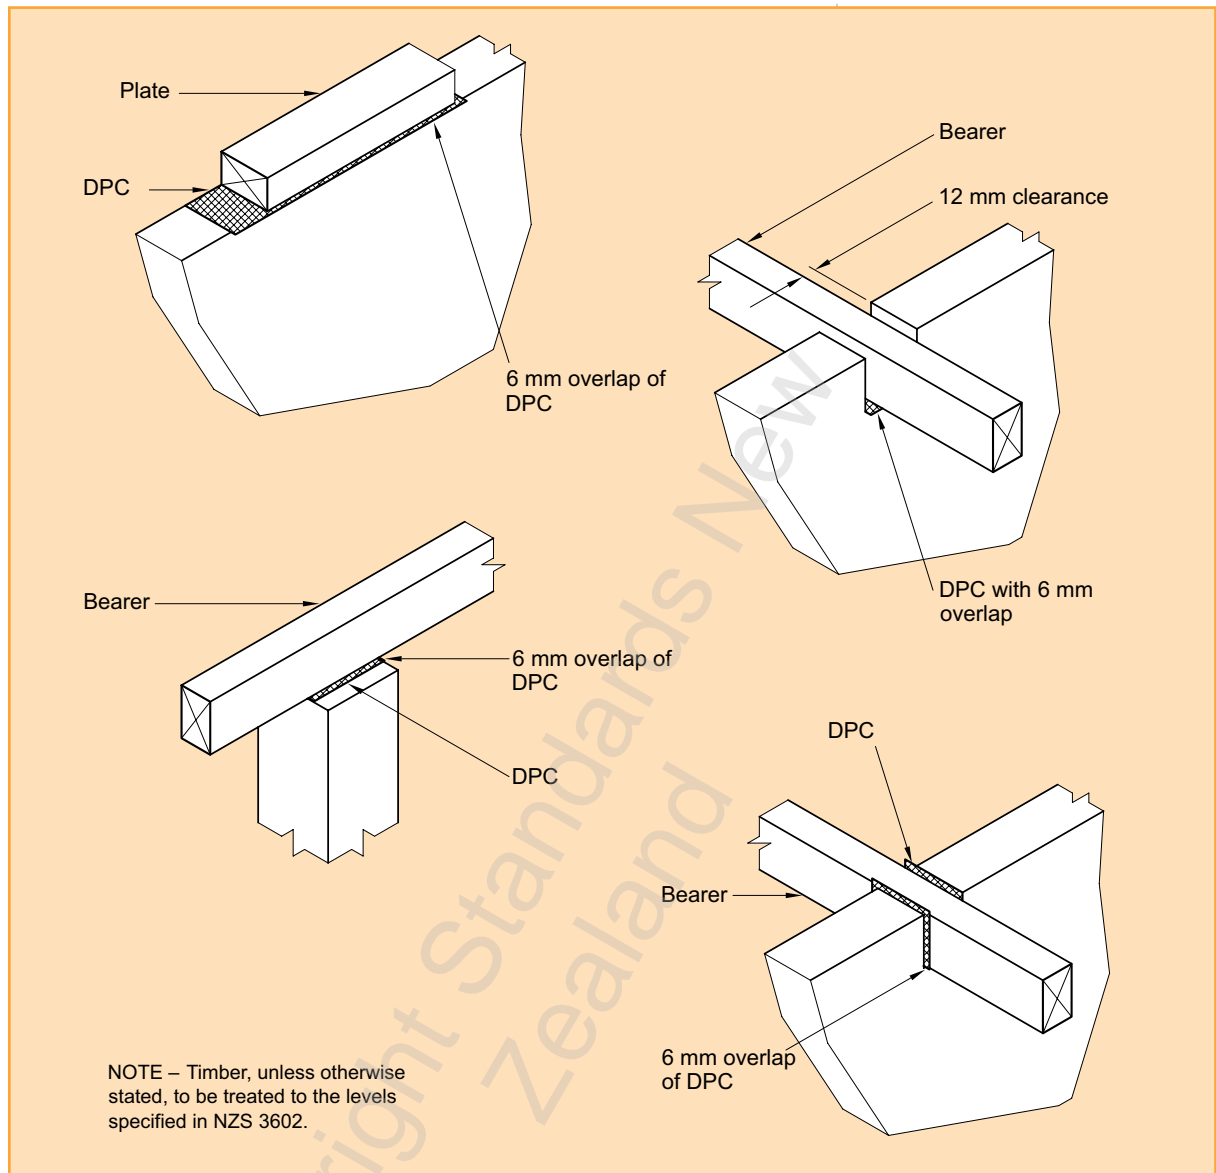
Protection of subfloor framing timber from direct contact with concrete or masonry
